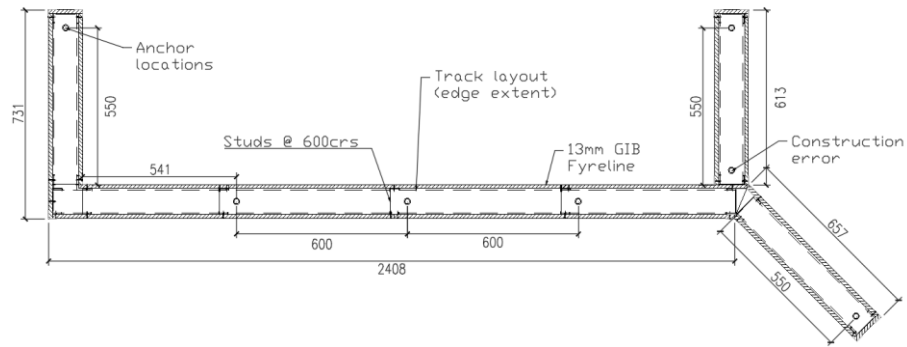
Specimen A1 & A2 dimensions with top track anchor locations (dimensions in mm)
